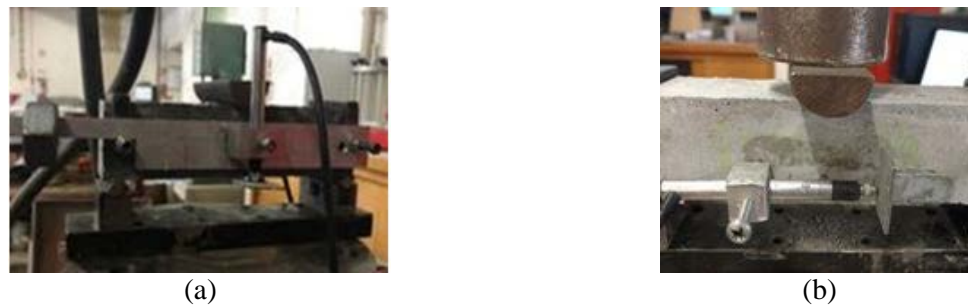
Three-point bending test set-up: (a) view of full length of specimen, (b) crack mouth opening displacement measurement.
